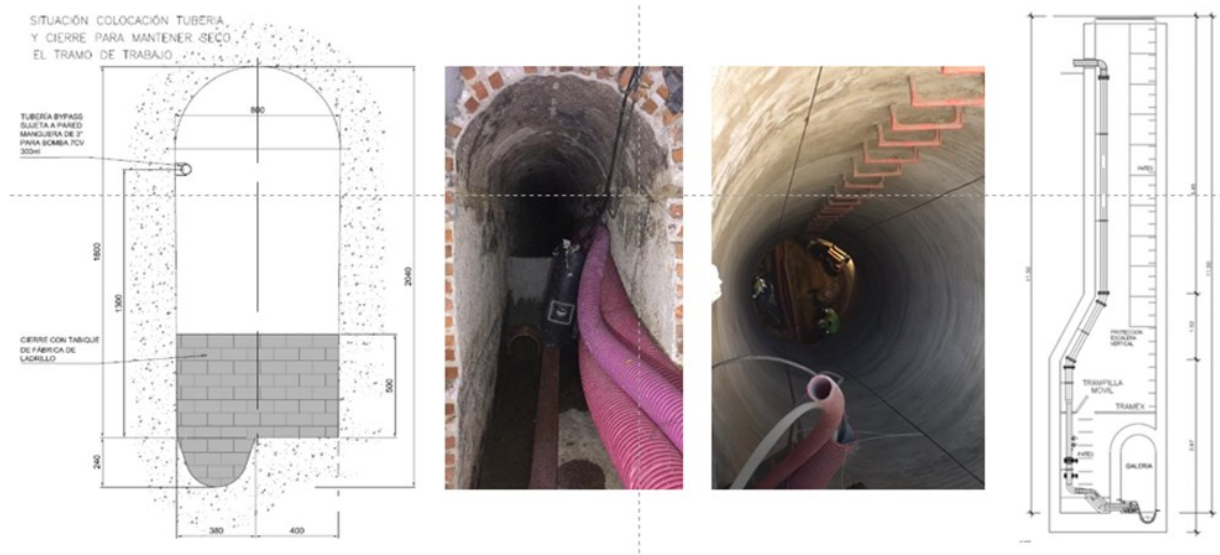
Left, plane of section and photograph of the containment dam and the pumping installation that allows the installation, on dry work area, of the exchanger and the pumping bypass for wastewater. Right, photograph and section of the access well. Source: Eneres.
